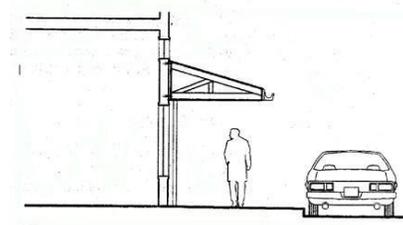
A nono-truss canopy attaching its vertical chord to the structural frame
